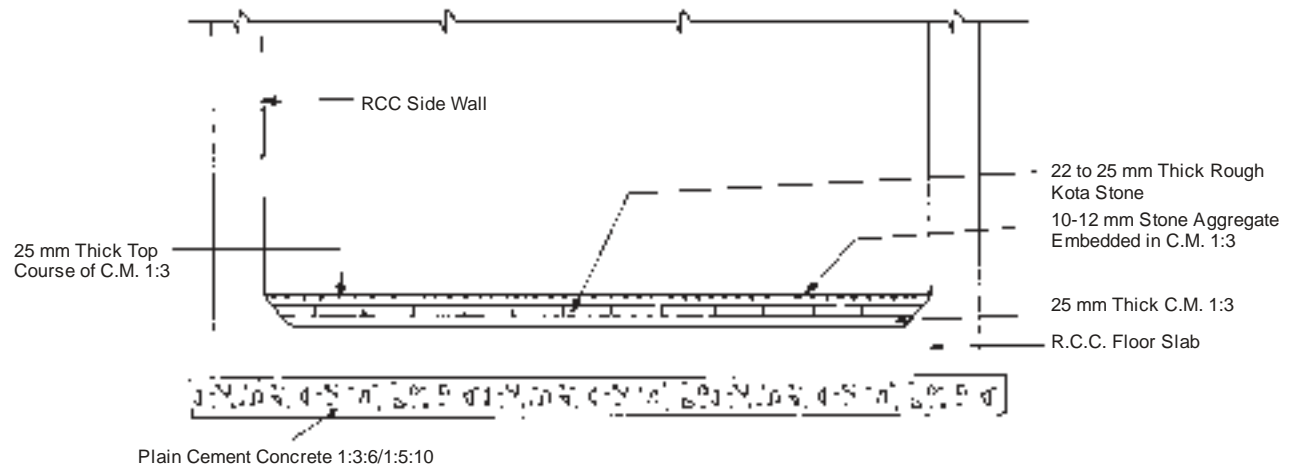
Water Proofing Horizontal Surfaces from Inside of a U.G. Structure
